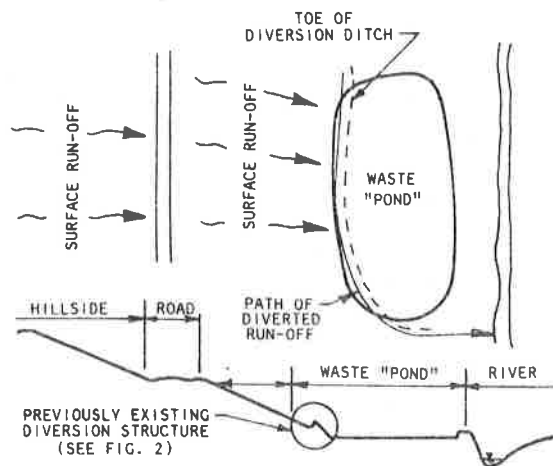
PLAN & PROFILE OF PROJECT AREA
